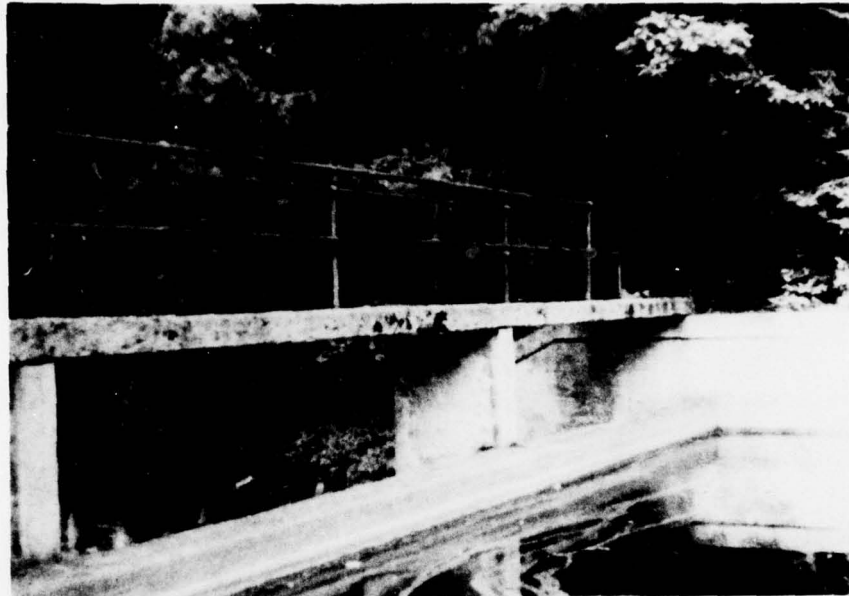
SPILLWAY AND RIGHT WINGWALL
